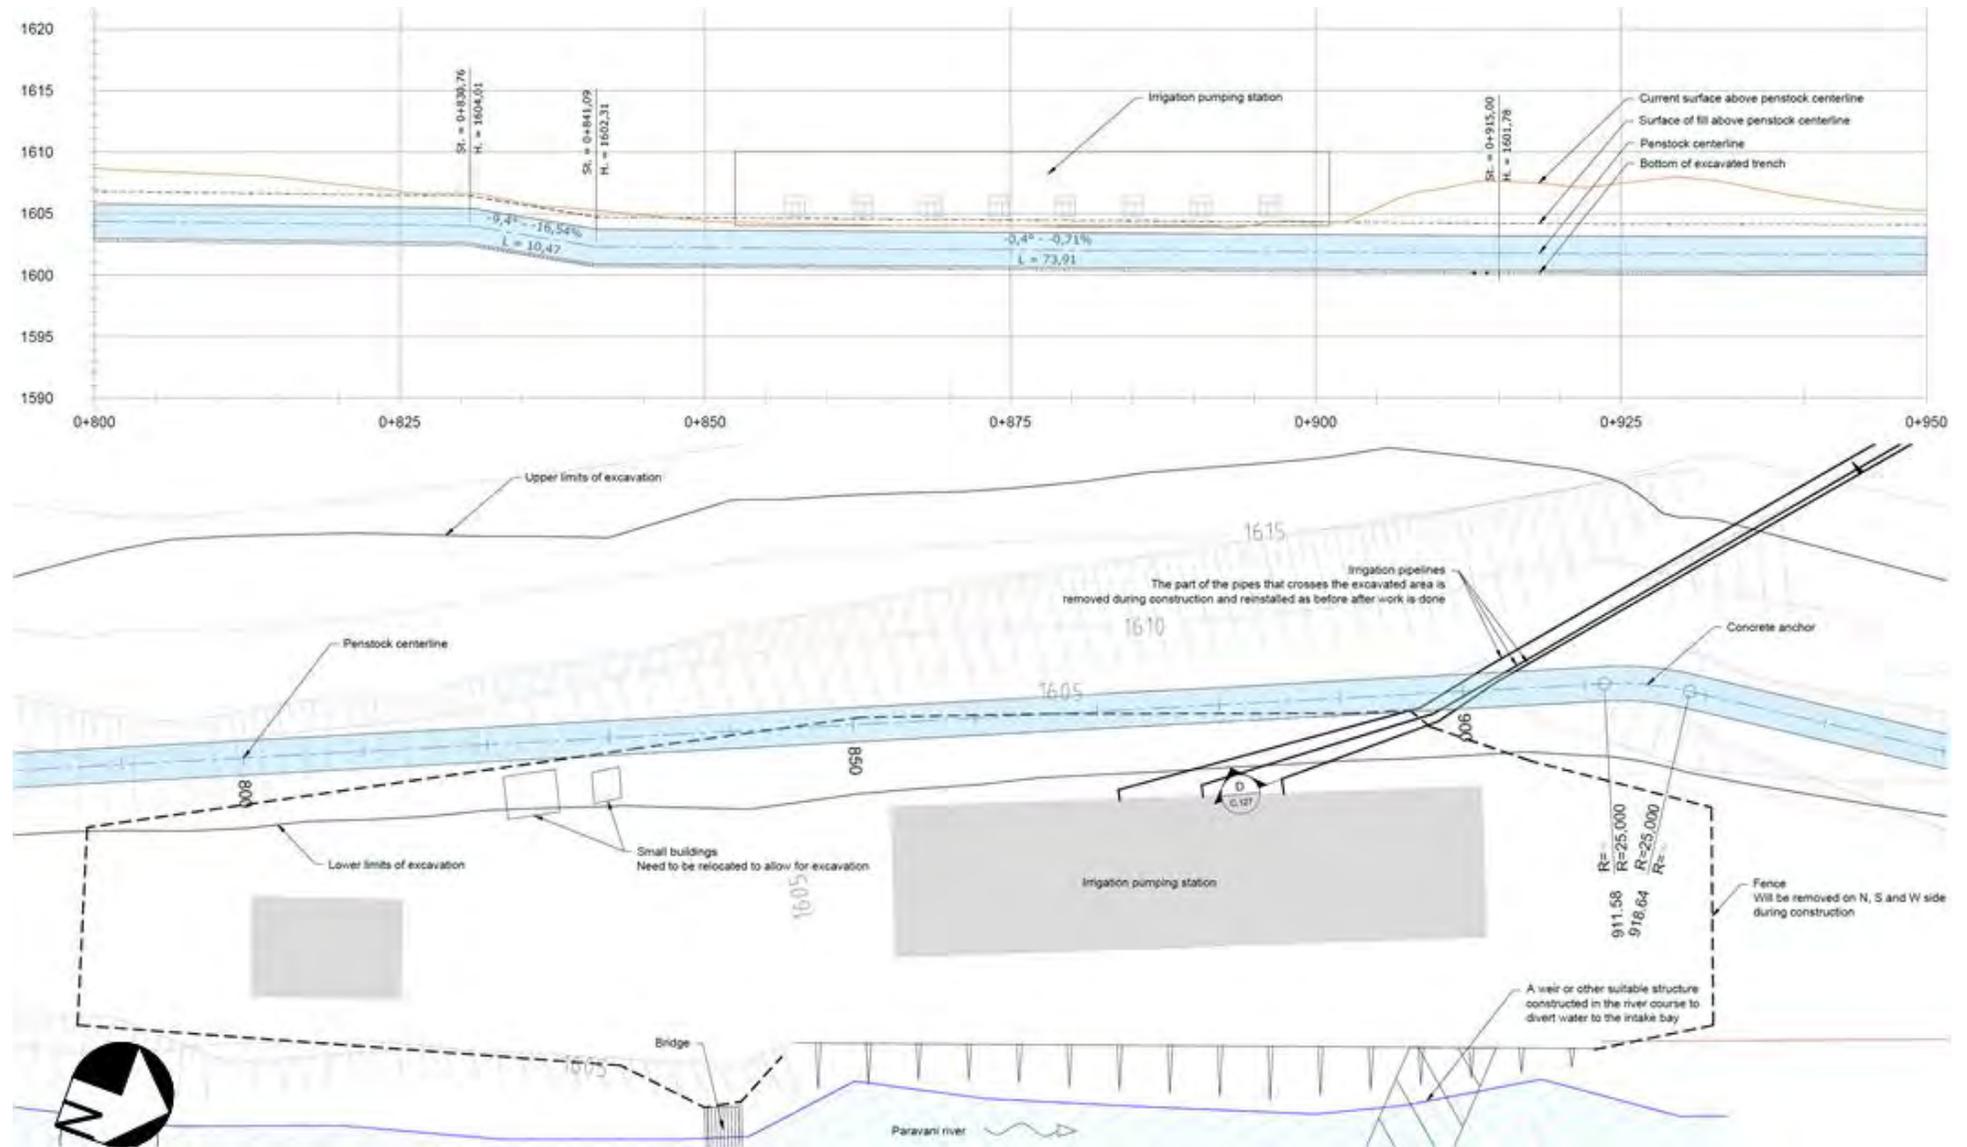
Penstock on Irrigation Pumping Station Site, Longitudinal Section and Plan.
